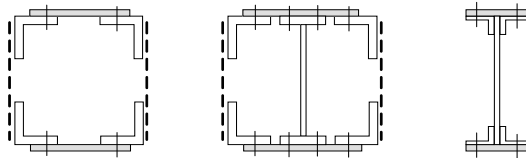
Strengthening structural members by bolting steel plates [20].
